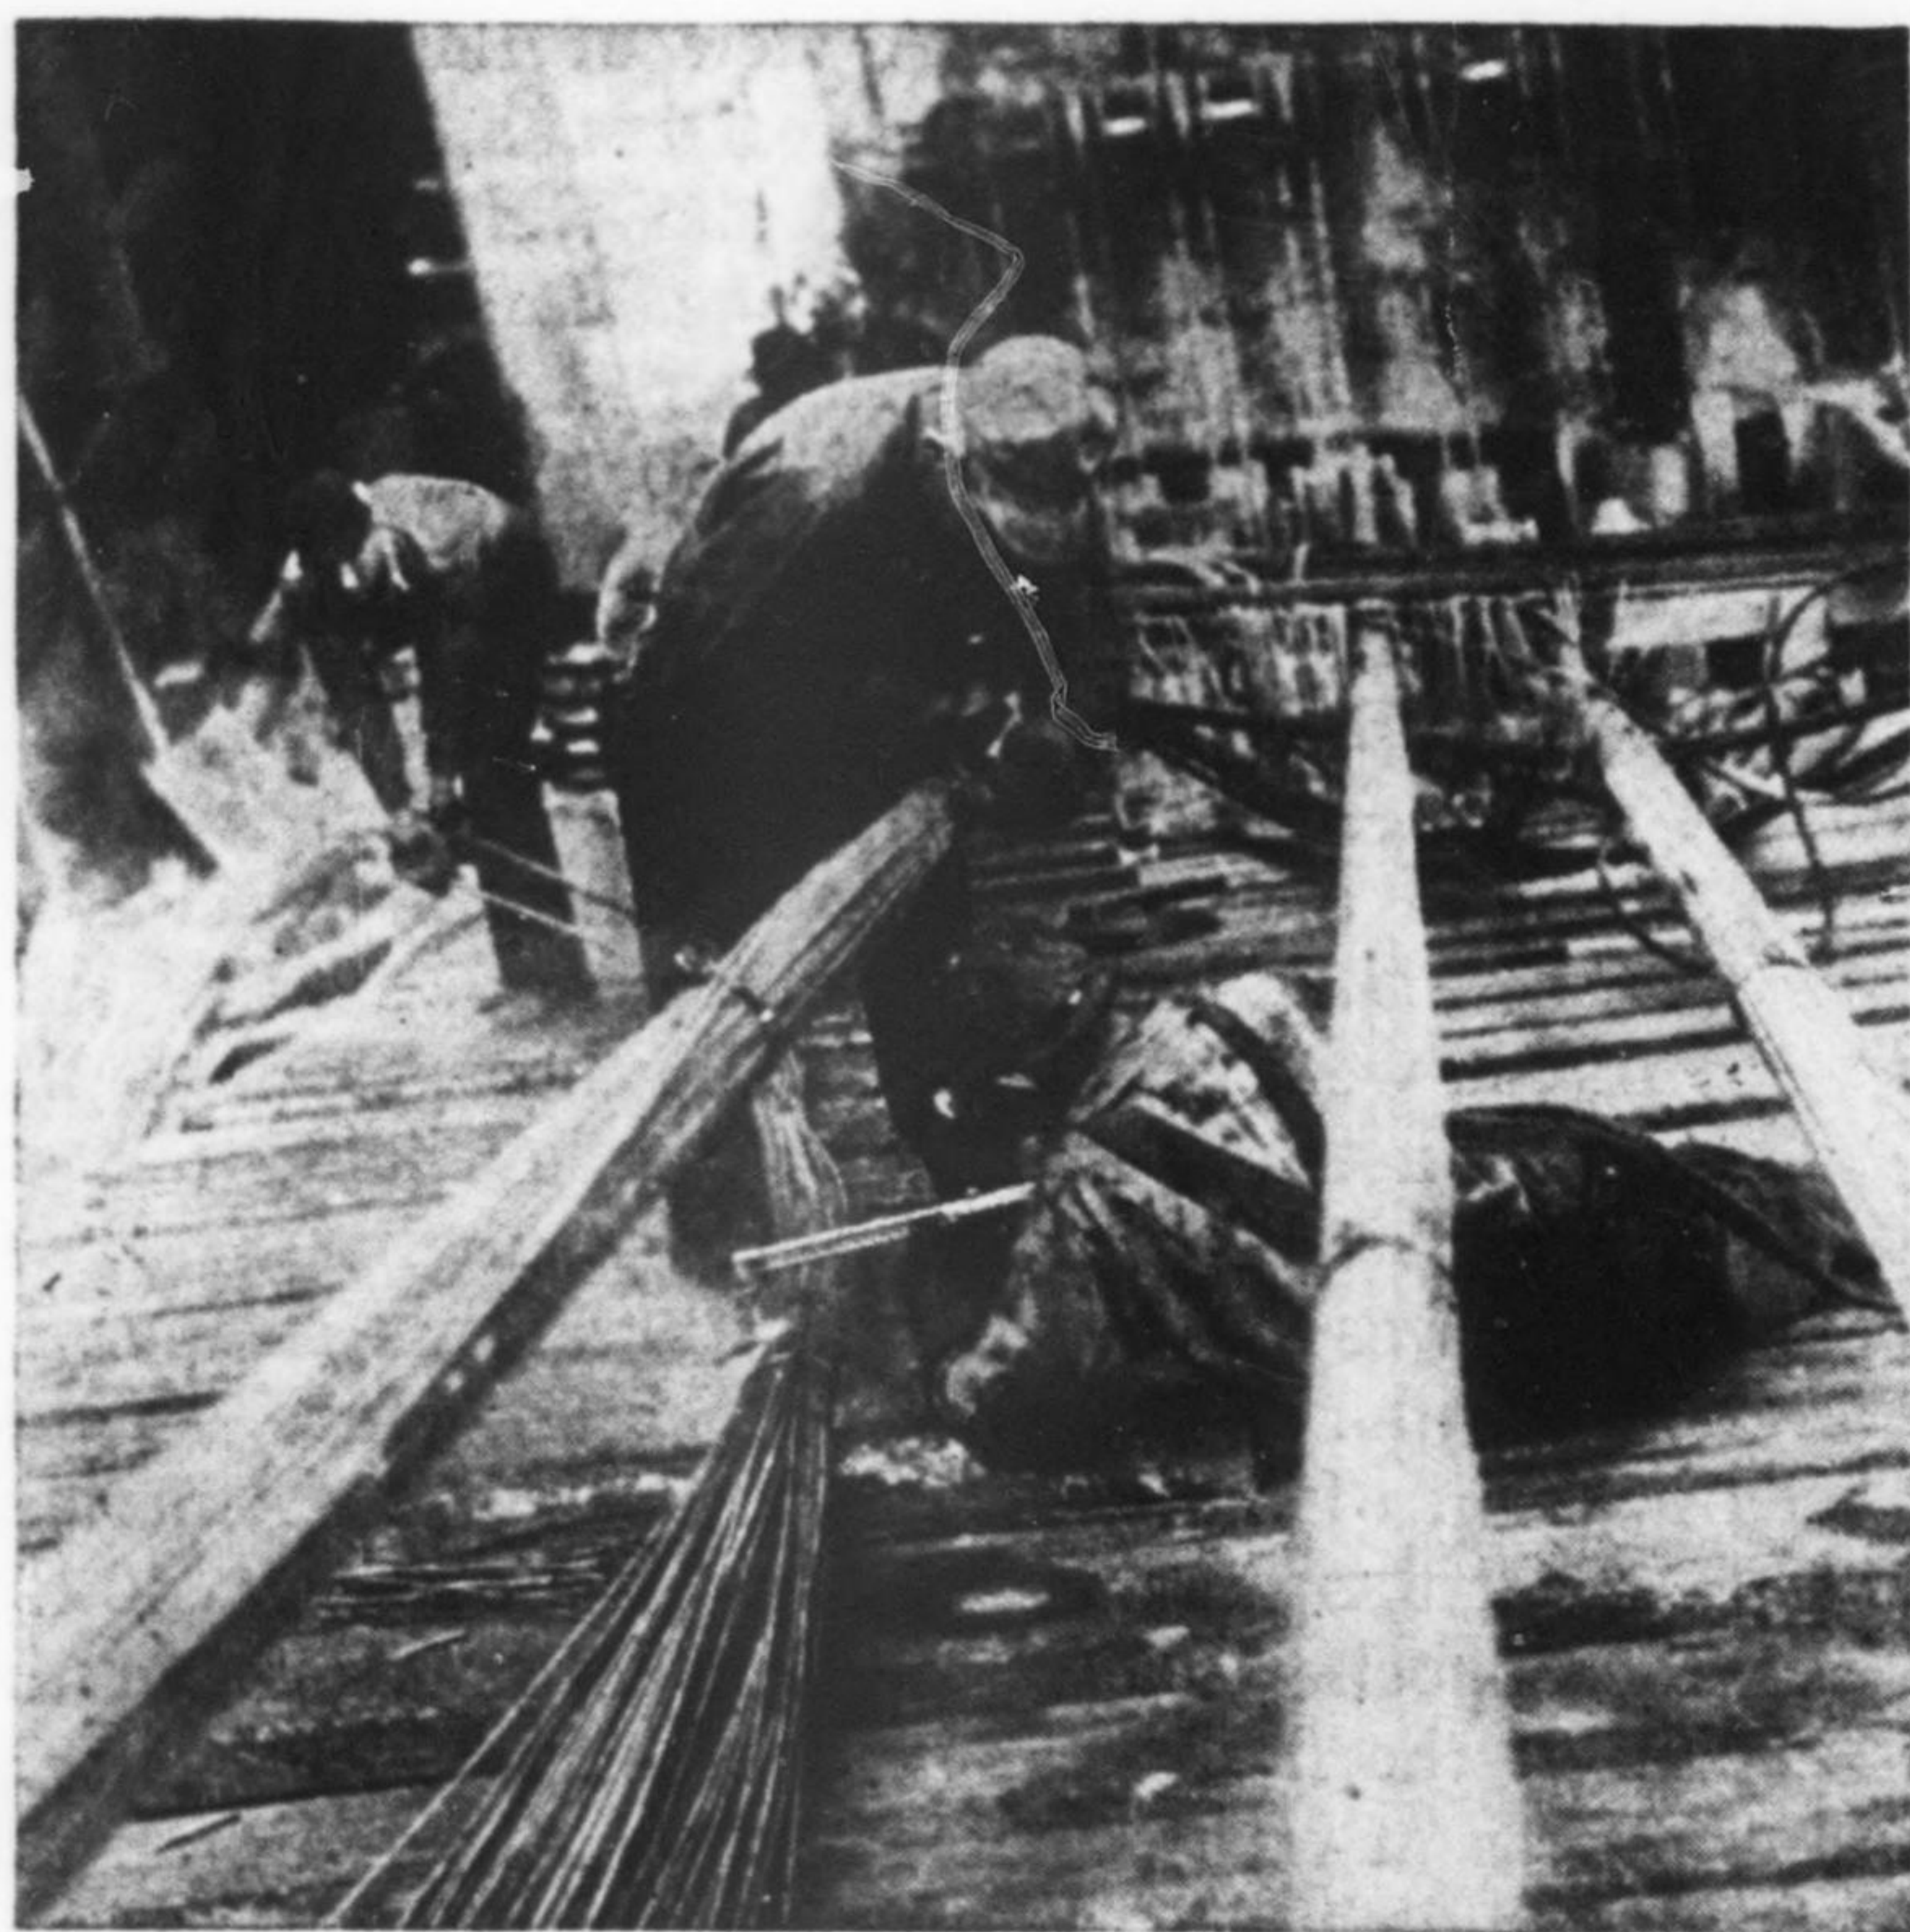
CUTTING OPERATION AT DETROIT WEST ANCHORAGE
